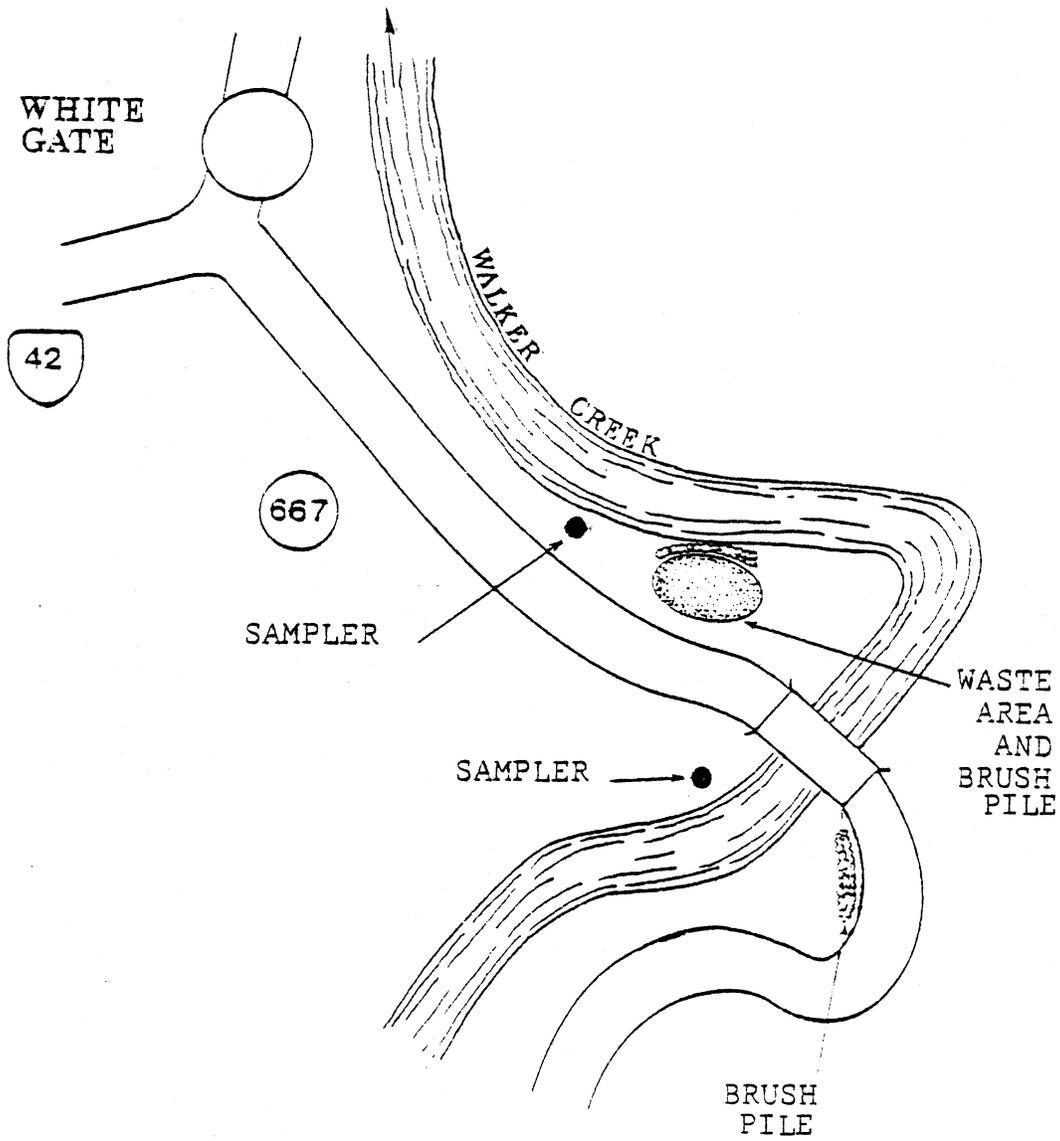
Plan view of Big Walker Creek erosion controls and sampler locations.
